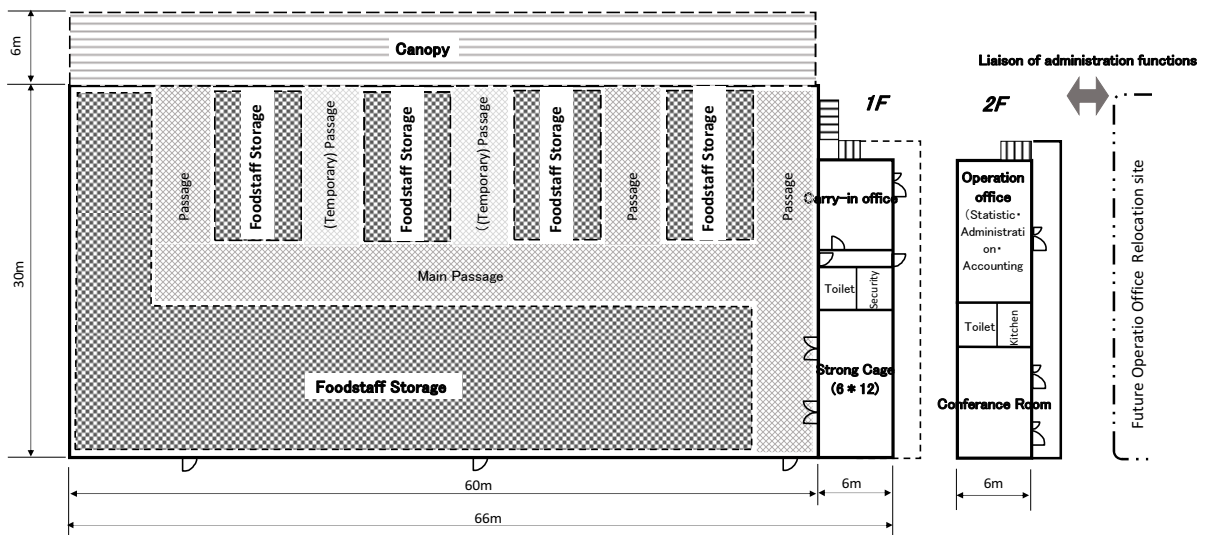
Function Layout Plan-1 in General Cargo Warehouse (basic layout)
